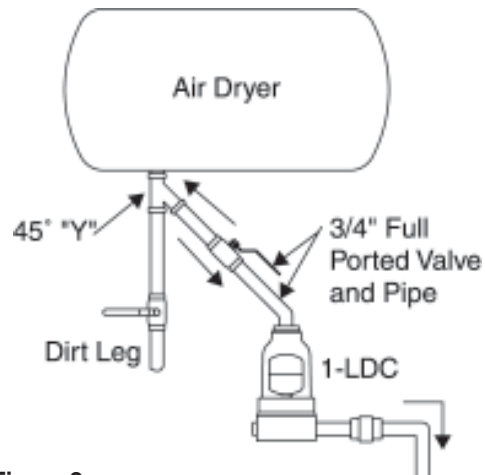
Drainer installed below dryer. Plug side inlet. Use top inlet and 3/4" pipe. A full ported valve must be used. Keep piping as short as possible.
